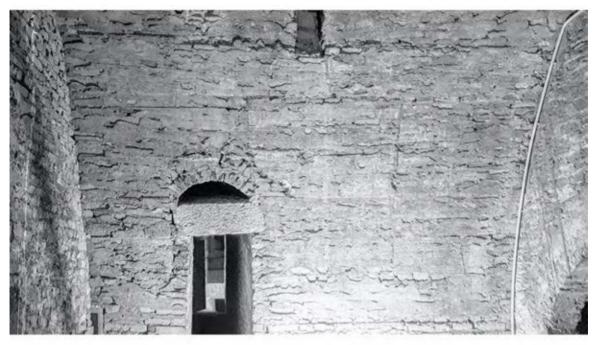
Traces of wooden boards on the intrados of a pointed arch under the northern tower (picture: author)
